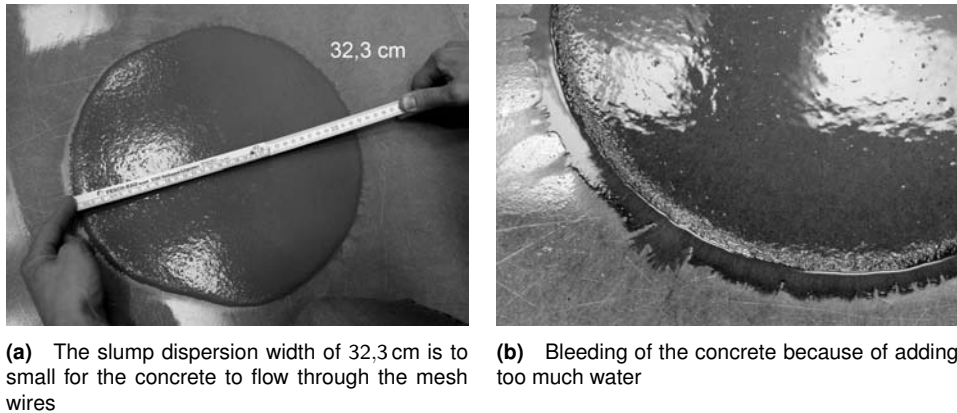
Control of concrete slump; an extreme water cement value leads to concrete bleeding
